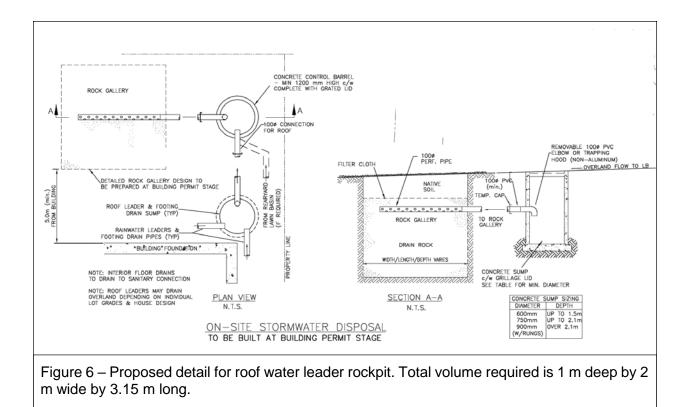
lays out the proposed details for this rock pit. Final location and details should be determined in the field, with the following requirements maintained:
